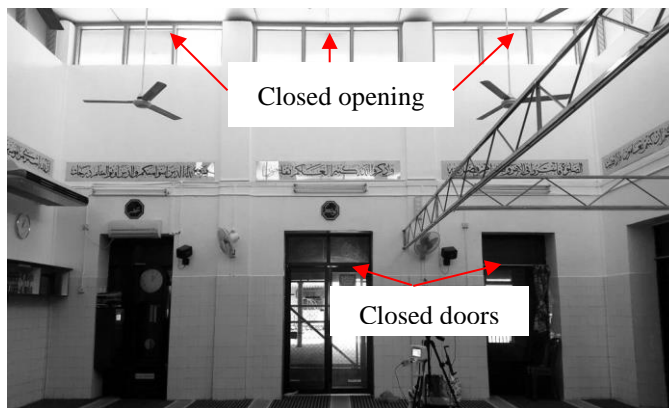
Example of an opaque wall, where openings and doors were closed (MQS09).
